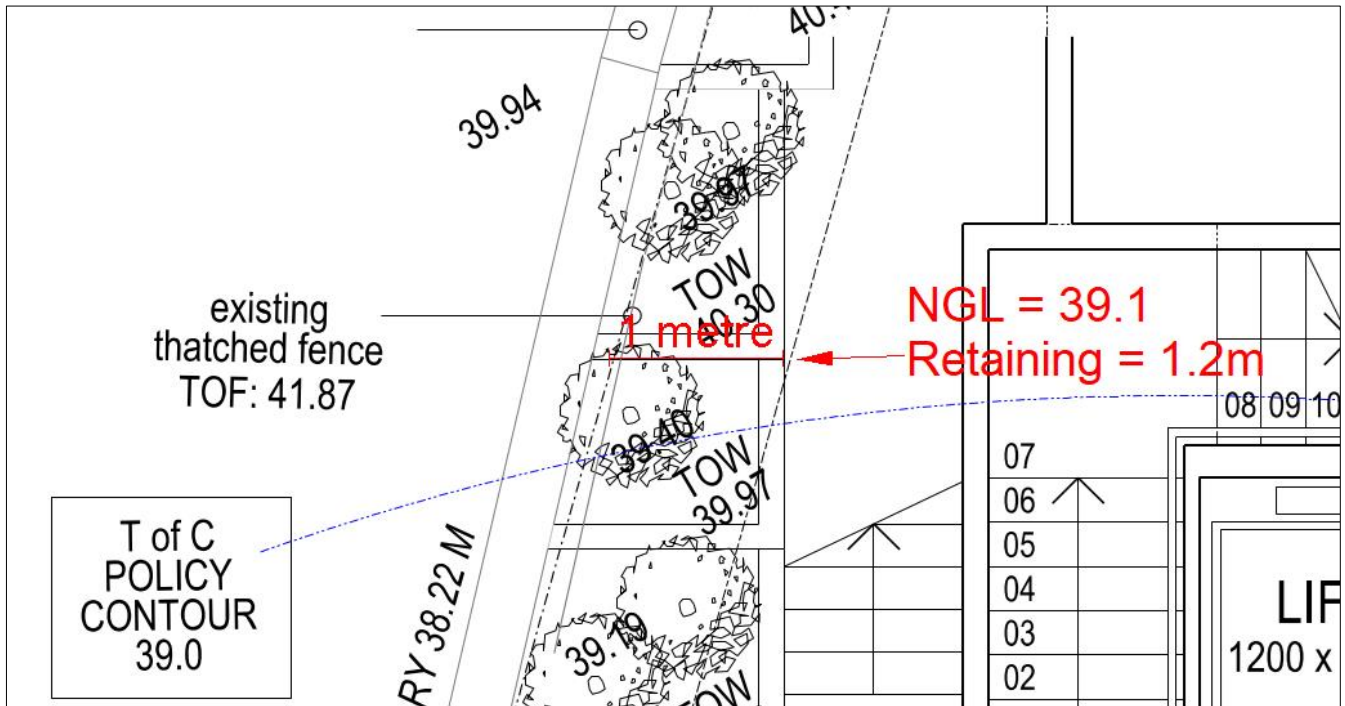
Marked-up floor plan showing the proposed retaining along the south-eastern boundary.
